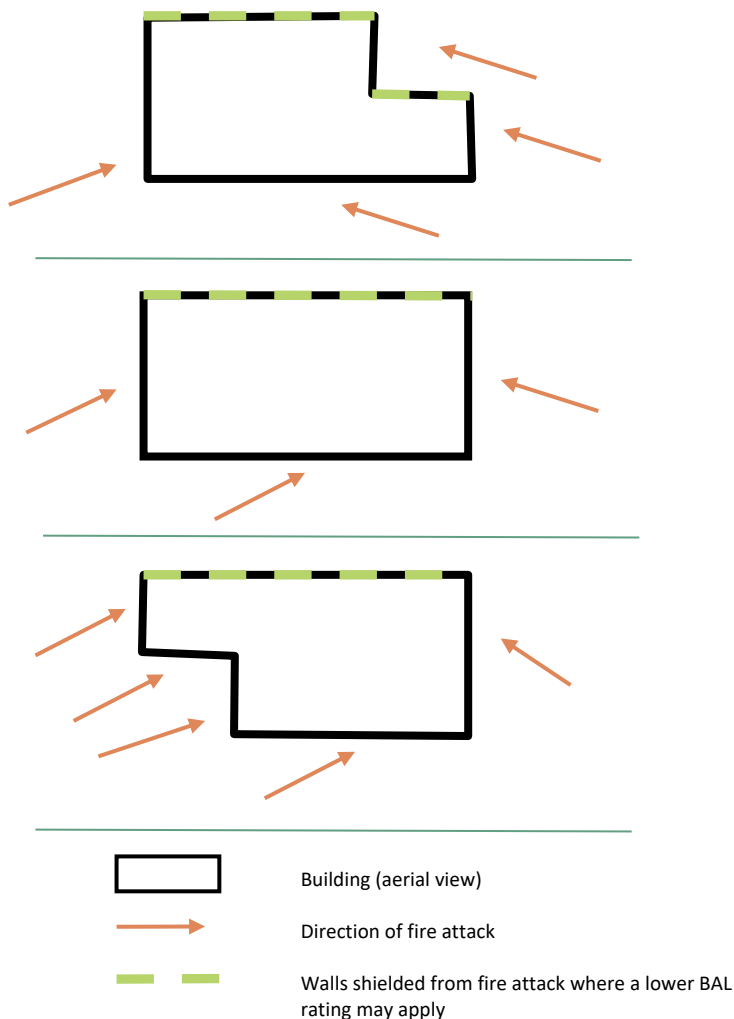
Examples of walls subject to shielding (Source: Standards Australia 2009)
